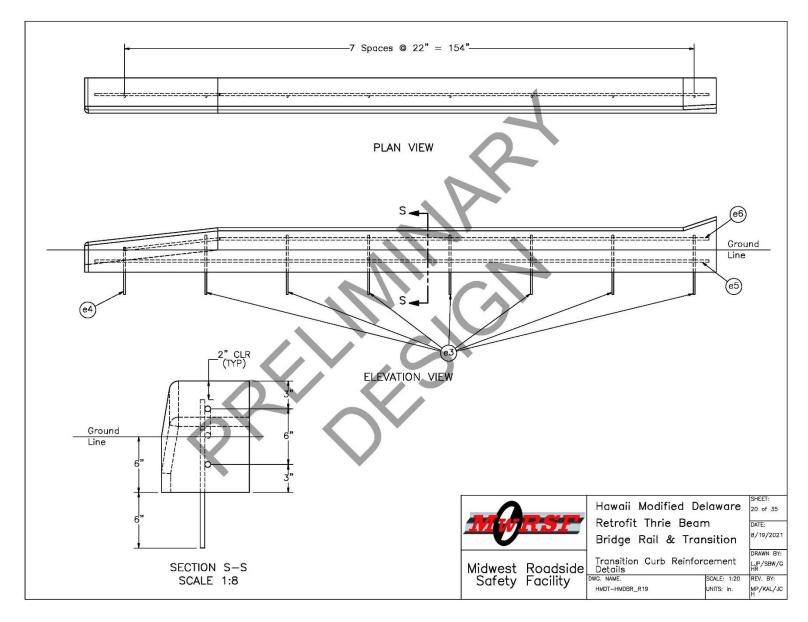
Transition Curb Reinforcement Details, Test No. HMDT-1
